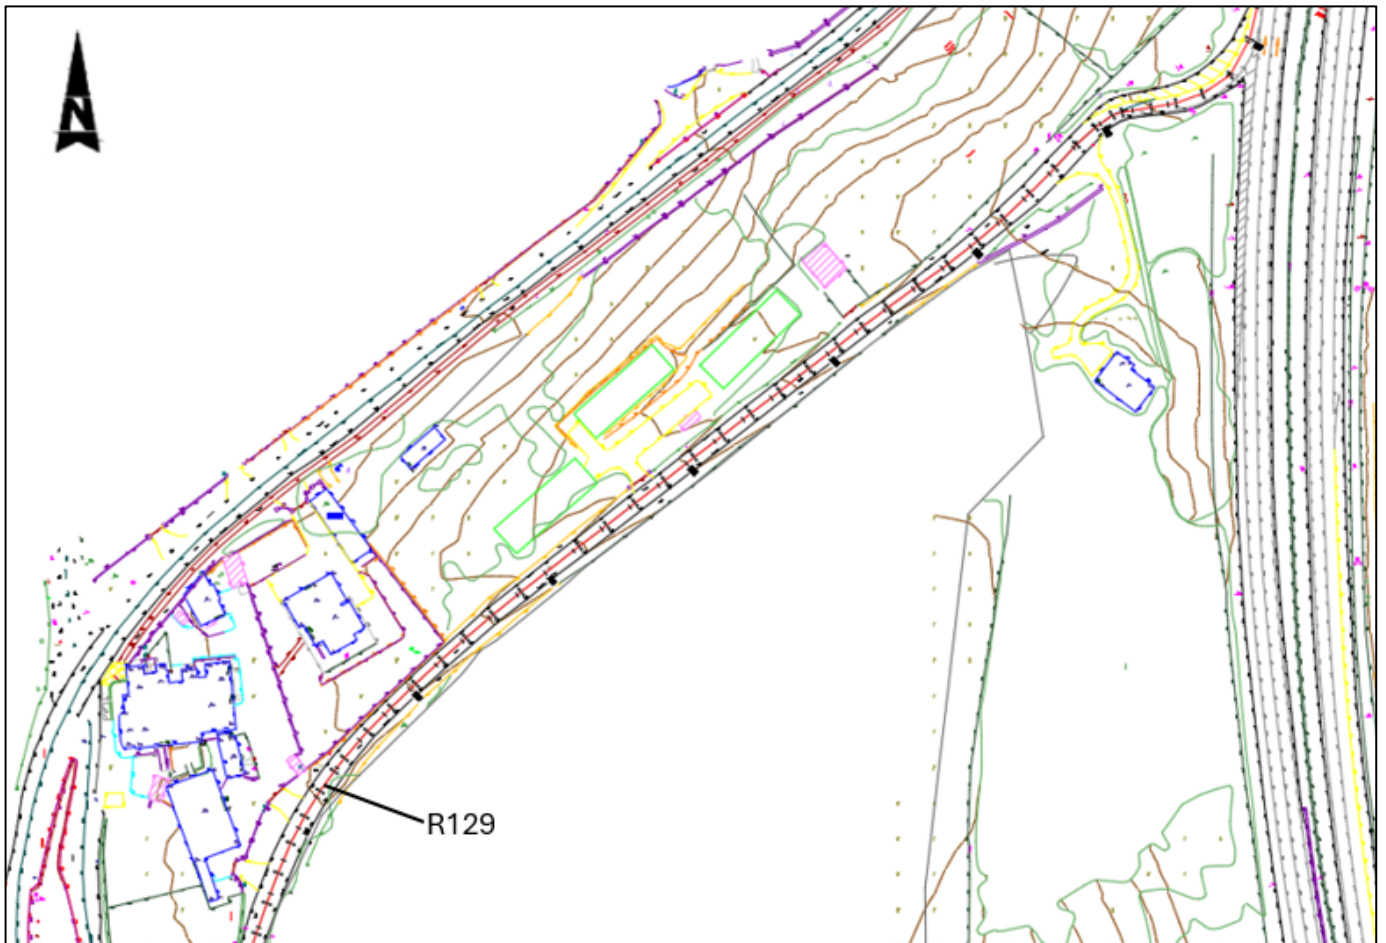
Horizontal Alignment of L5406 Willow Grove Link Road
